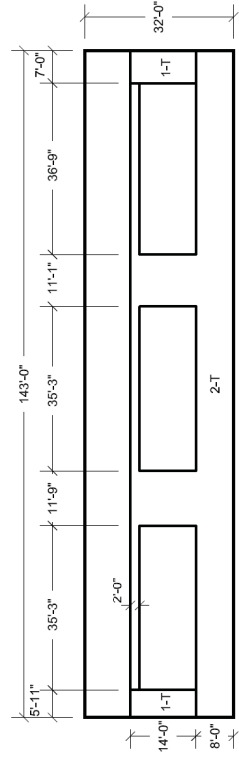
H.6-65: PUMP HOUSE SOUTH WALL LOOKING SOUTH
